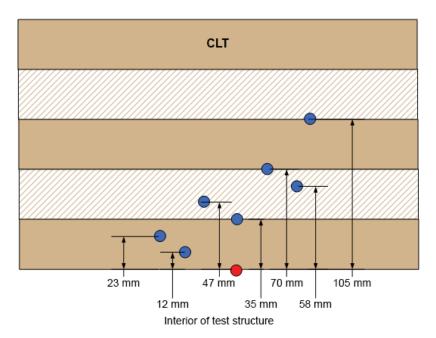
Additional surface thermocouples when the crosslaminated timber (CLT) was encapsulated (GWB, gypsum wallboard).
